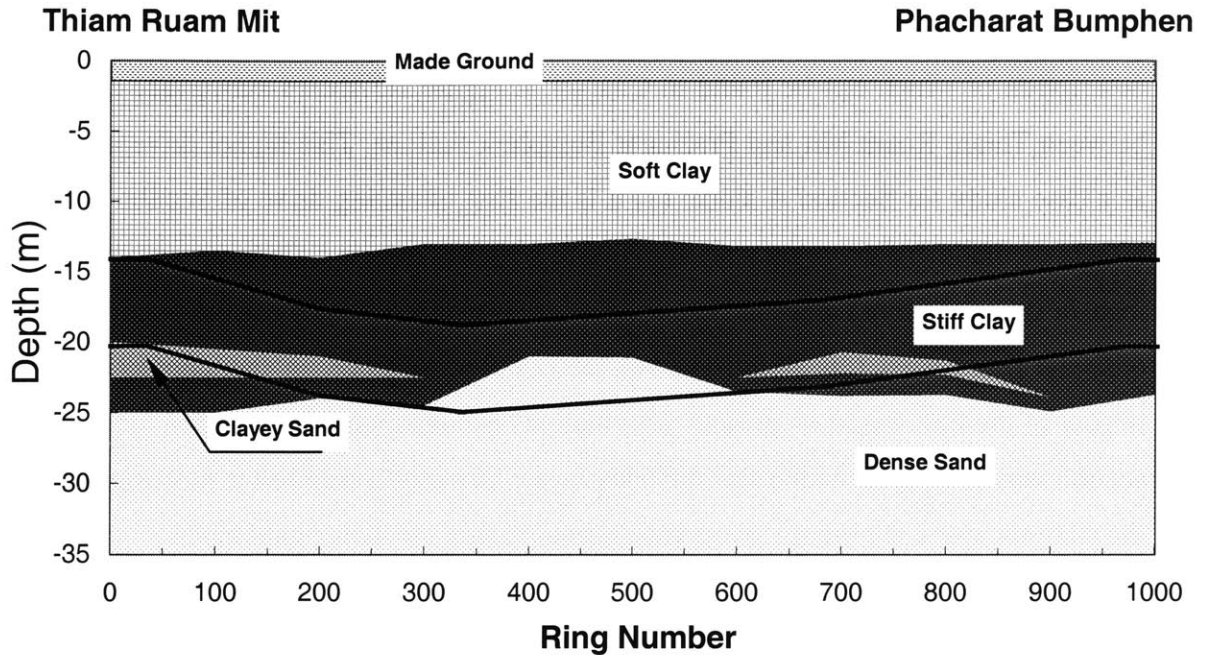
Subsurface conditions of tunneling section (southbound) between Thiam Ruam Mit and Pracharat Bumphen (Section A)
